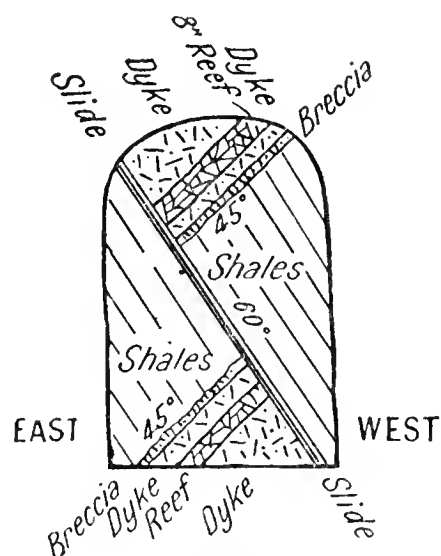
Section of South Face, 783-ft. Level. (Scale—6 feet to 1 inch.)
